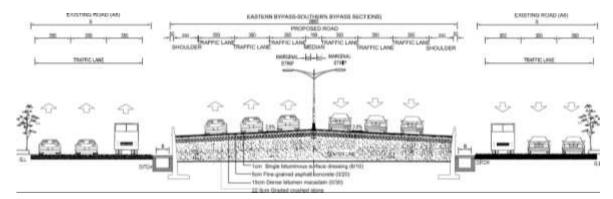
Typical Cross Section (28.6m) of Roadbed between K10+800-K15+564 Section
